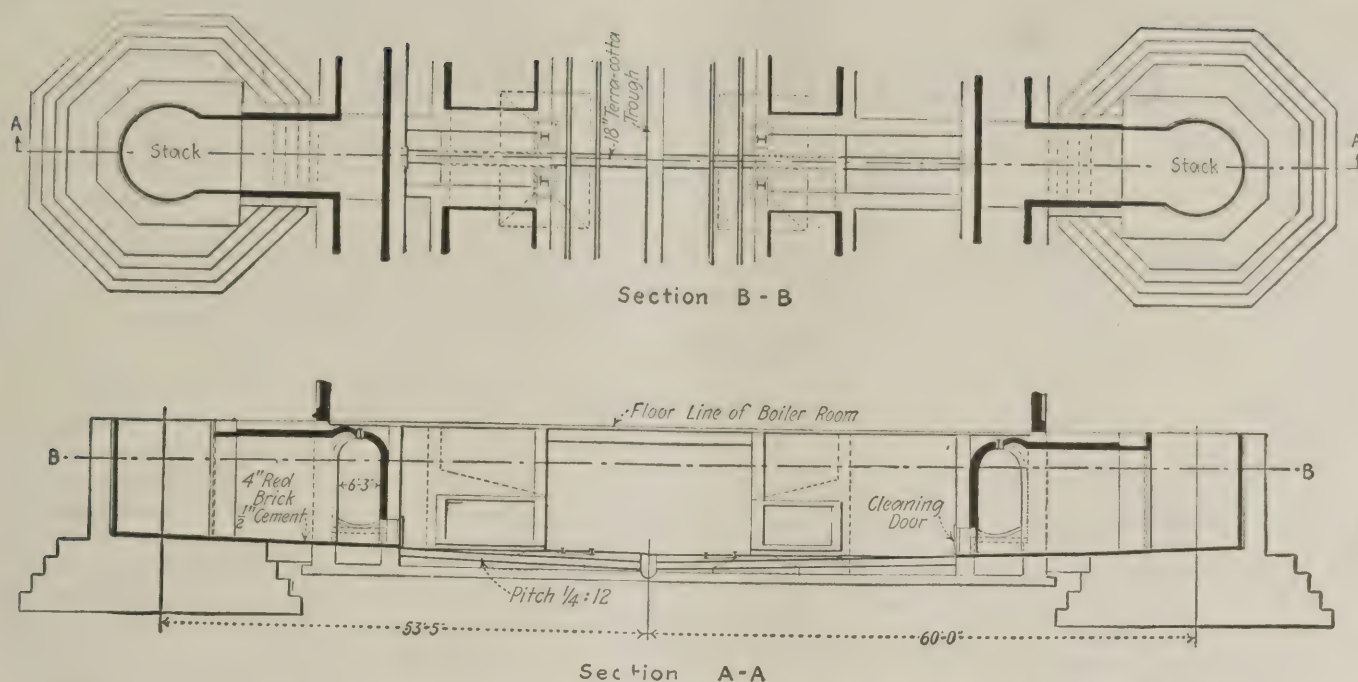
PARTIAL PLAN AND CROSS-SECTION AT CENTER LINE OF STACKS
